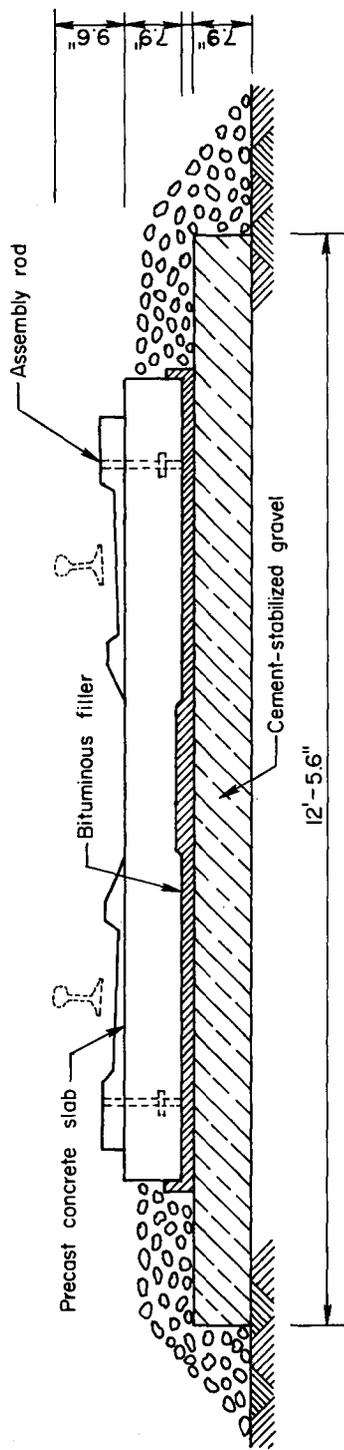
CROSS SECTION OF TRACK WITH PRECAST CONCRETE SLABS
